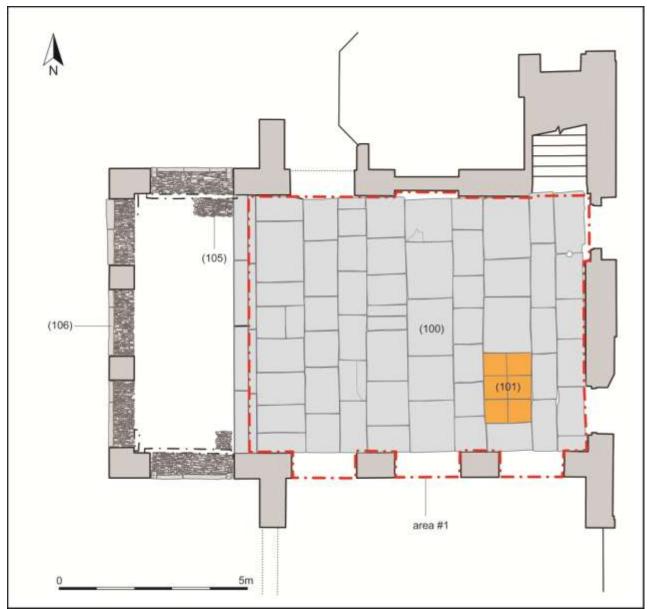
Plan of area #1 showing undercroft slab (101) and cobble floor (105) surface.
